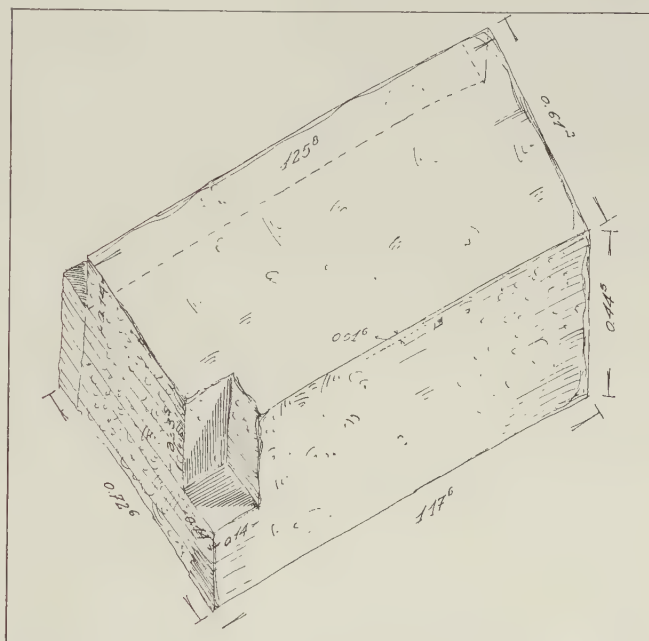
Bedding Block for Bench and Stair of New Bouleuterion
